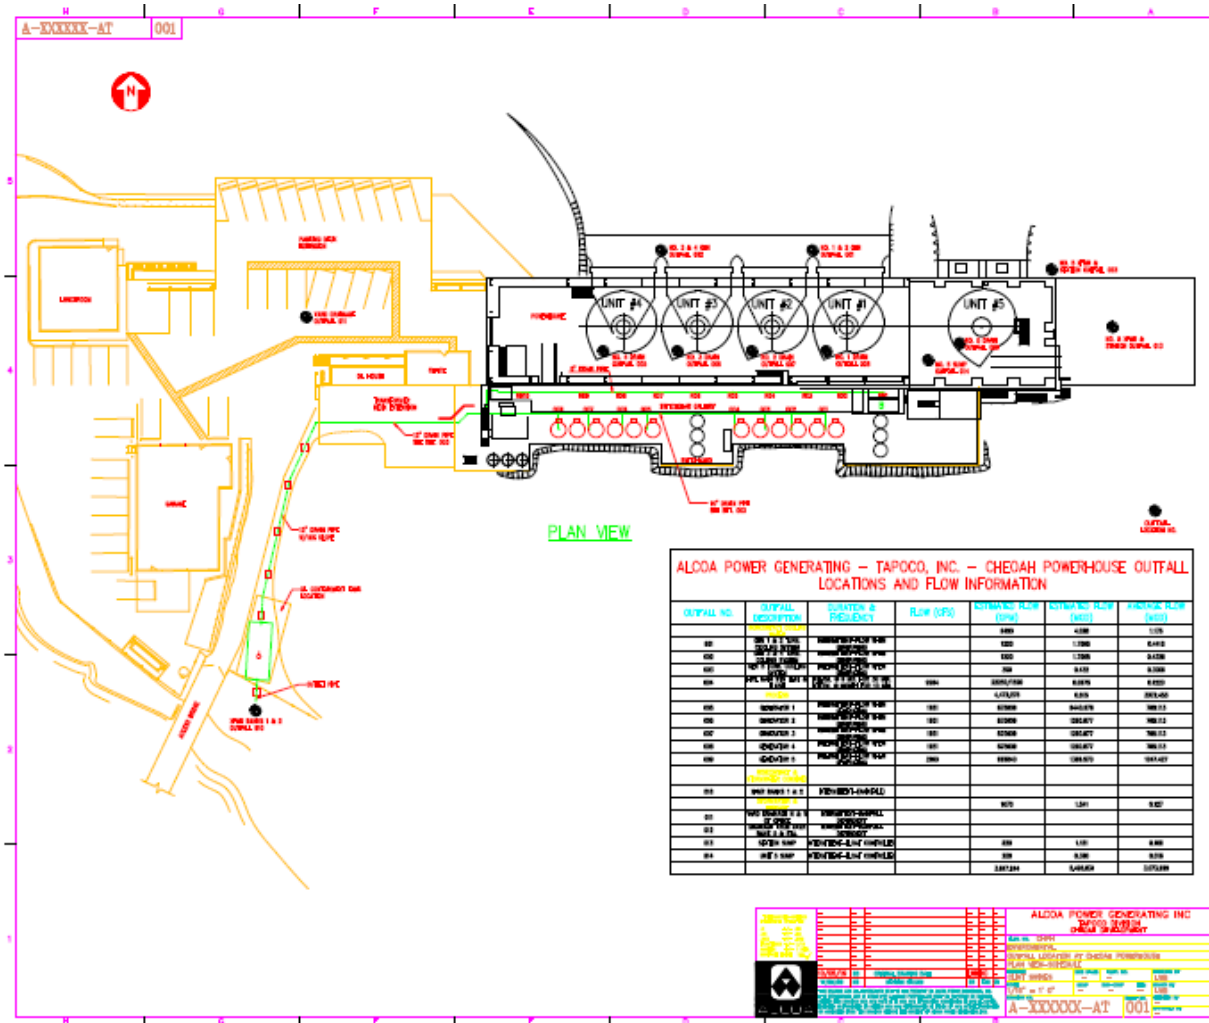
Cheoah Hydropower Plant Schematic Layout
